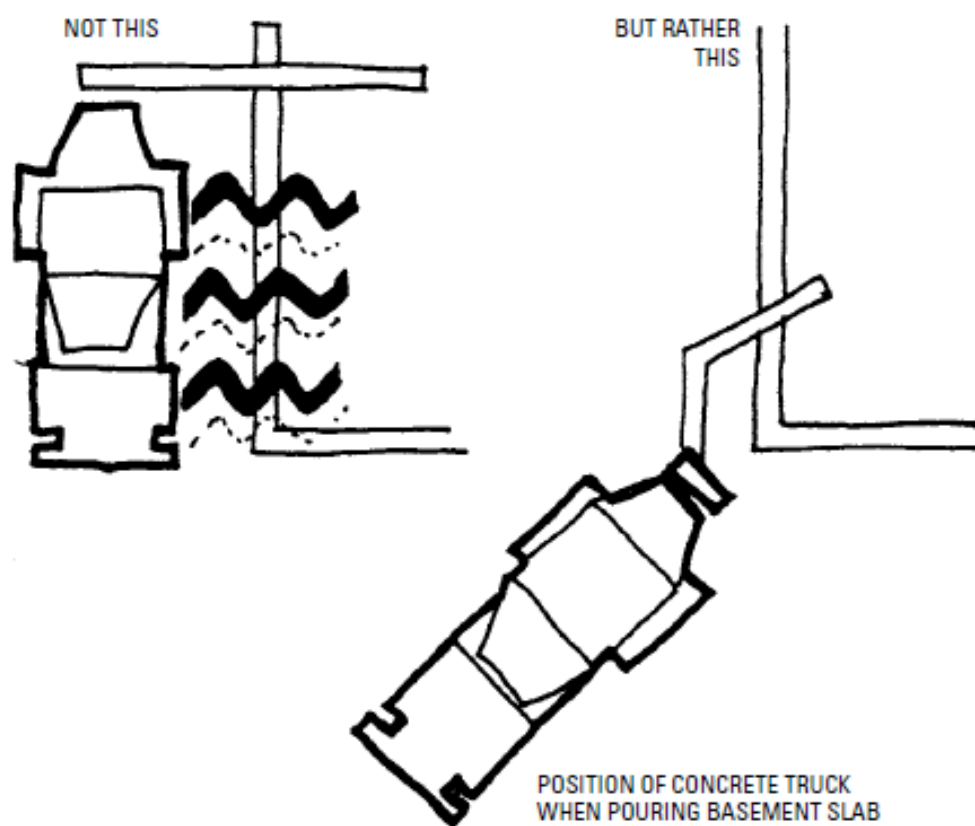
Avoid heavy equipment parallel to the foundation.
